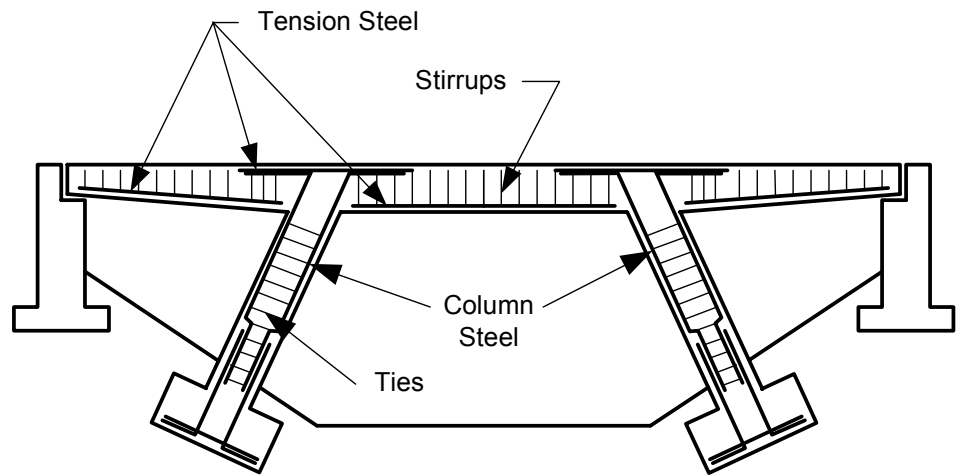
Tension, Shear, and Column Reinforcement in a Typical K-frame
